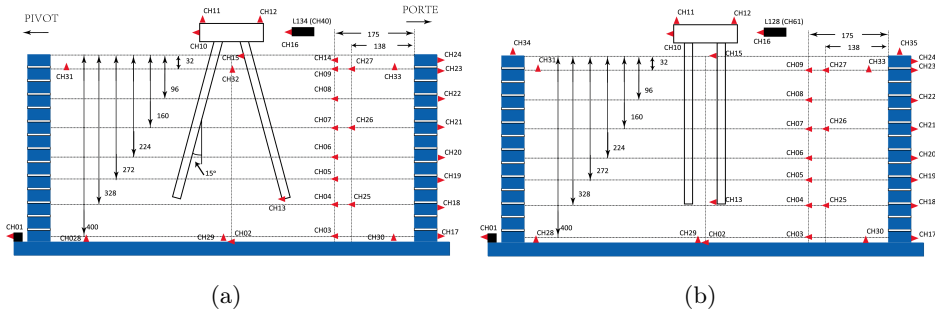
(a) Inclined pile foundation and (b) vertical pile foundation
